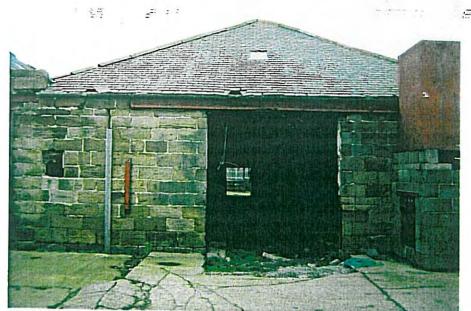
UNIT 6 - REAR ELEVATION (3.07)
